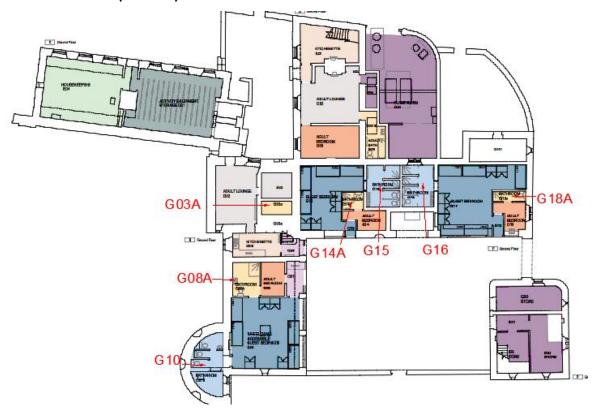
Ford Castle East Gateway, East Forecourt Wall and Handyman's cottage (NHLE 1154087) Ground Floor Bathrooms
